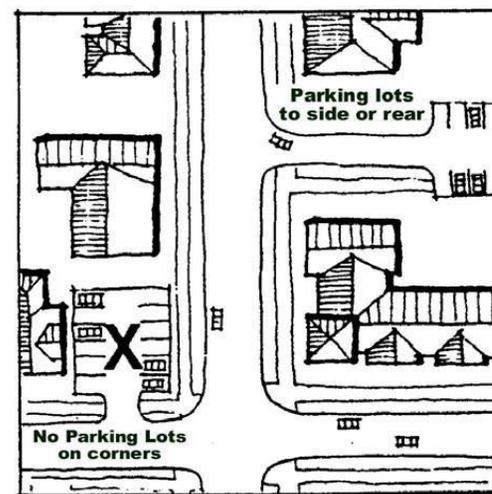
Parking lots shall not be sited on corners adjacent to intersections. Prominent building features should occupy the corner.
